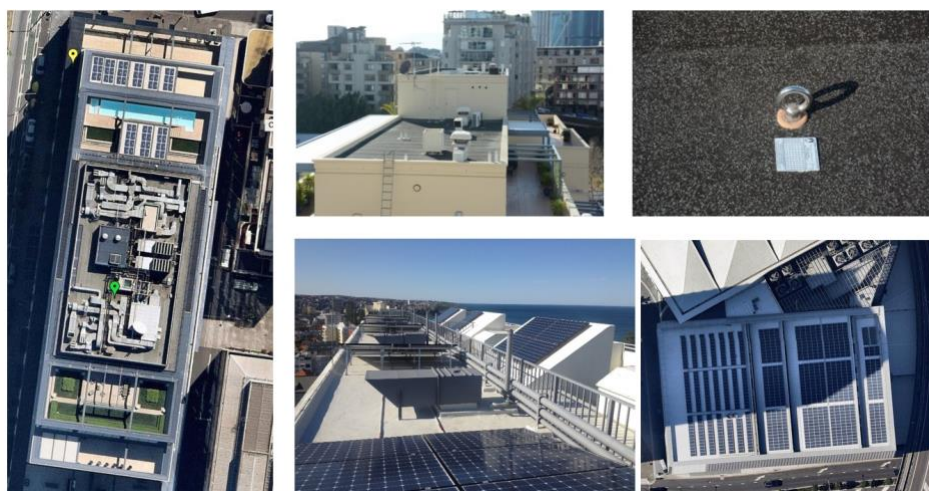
Rooftop obstructions and shading (clockwise from left): Roof gardens and pools, air-con, safety harness fixing points, shading, air-con.
